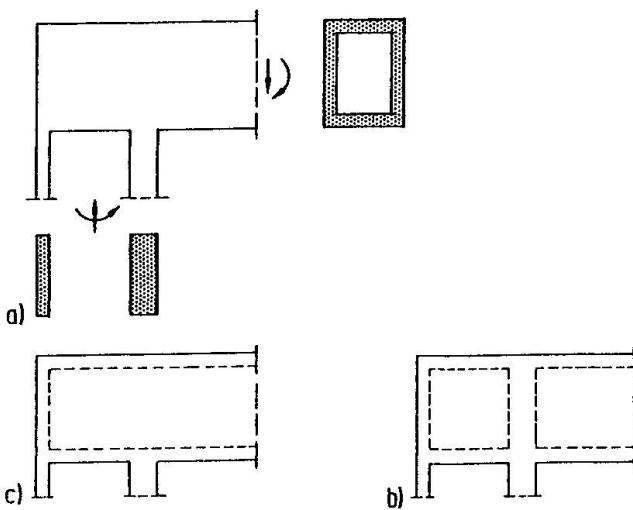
a) View and cross-section of the box girder and support walls. b) Longitudinal section with interior diaphragm wall. c) Longitudinal section without interior diaphragm wall
